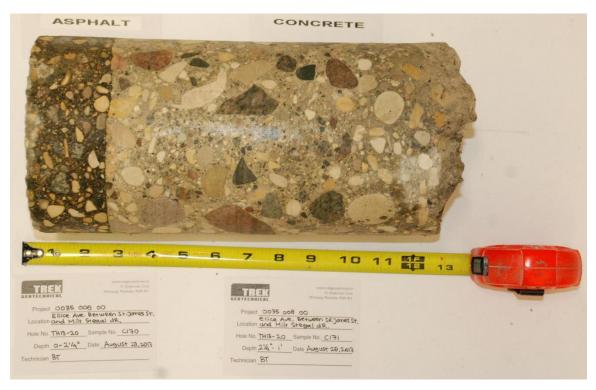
Asphalt and Concrete Core Sample from Test Hole TH13-20
